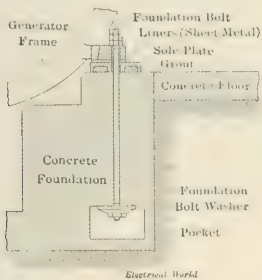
SECTIONAL VIEW OF SOLE-PLATE INSTALLED
